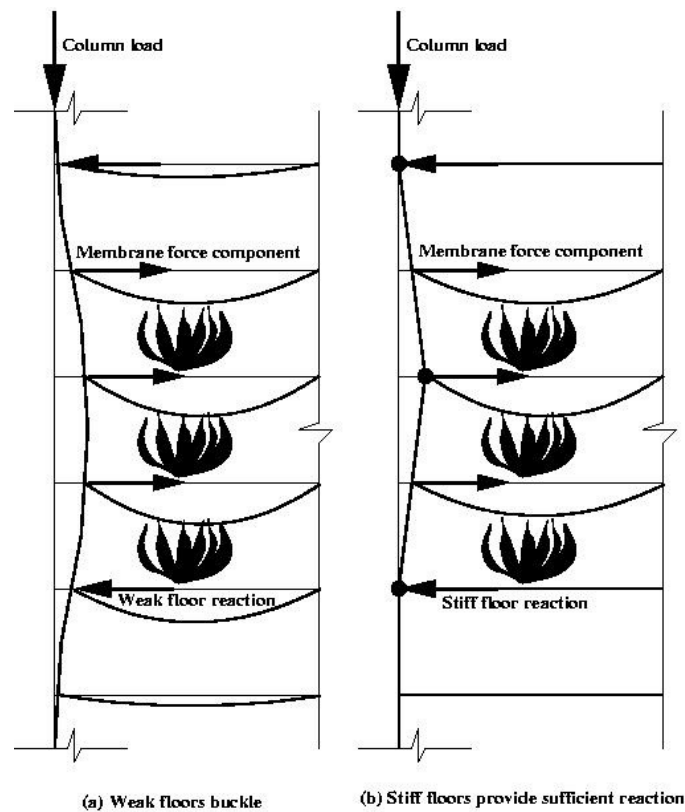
Mechanics of fire induced collapse in weak and stiff floor buildings
